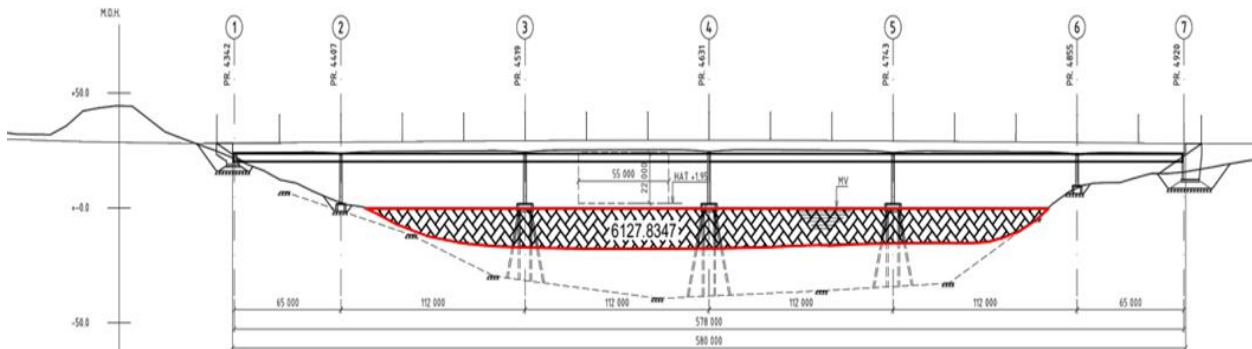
Cross section for the bridge (Nor consult, 2018)
